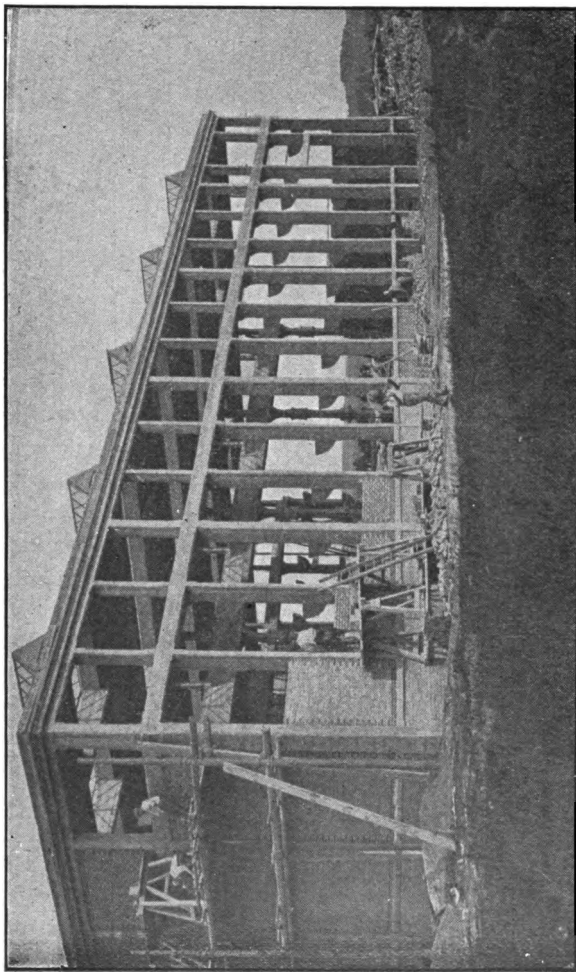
Factory Building. Reinforced Concrete Skeleton with Brick Filling.
